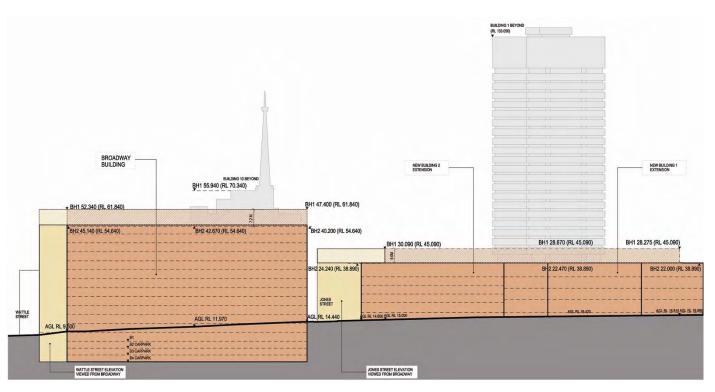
South elevation - Broadway (Source: BVN and DCM)
